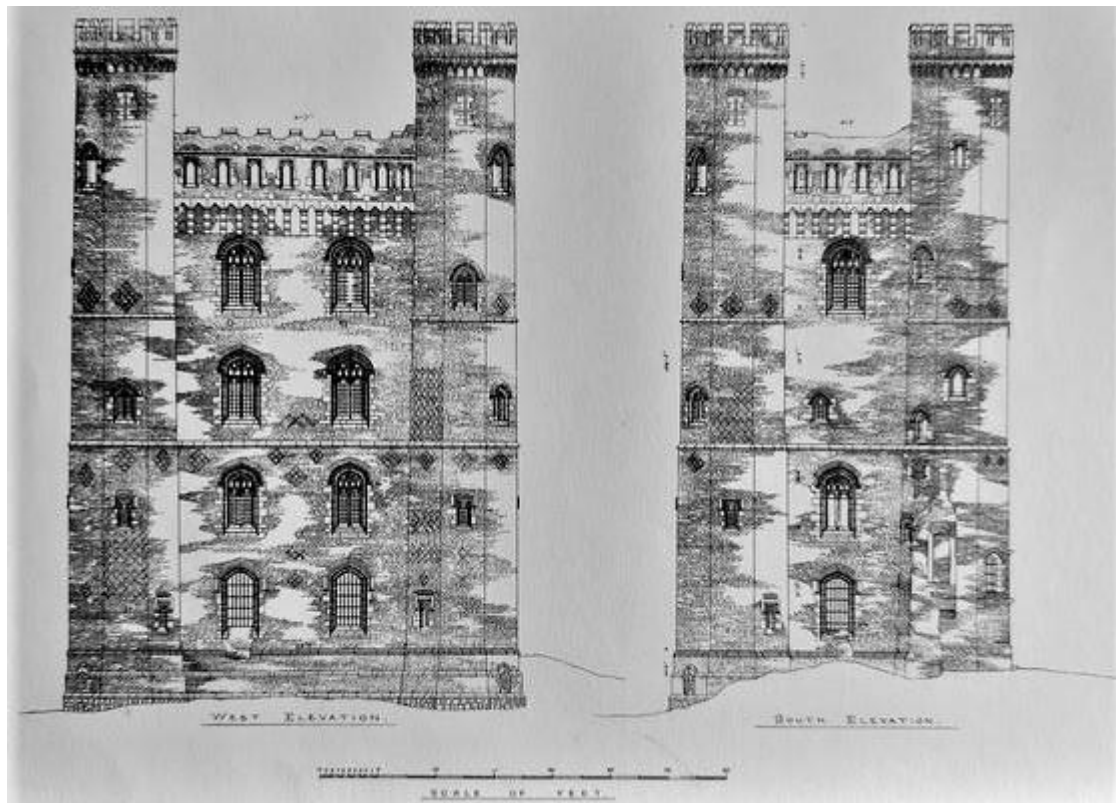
West and south elevations of Great Tower surveyed by Reed, 1872
